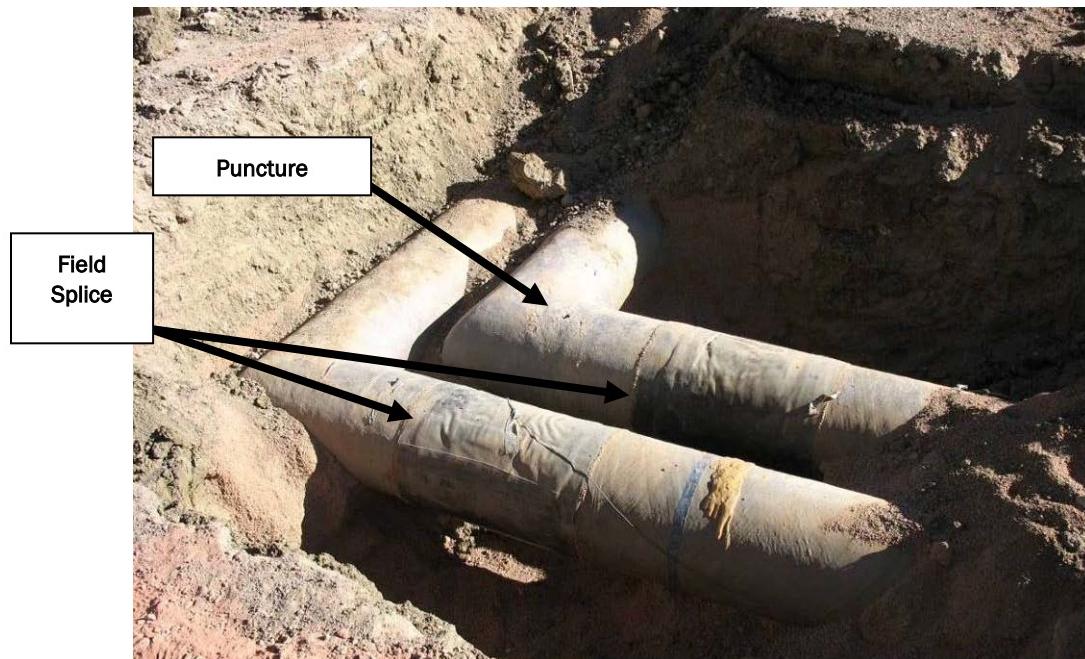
Site 3 elbow inspection showing defects, facing northeast.
